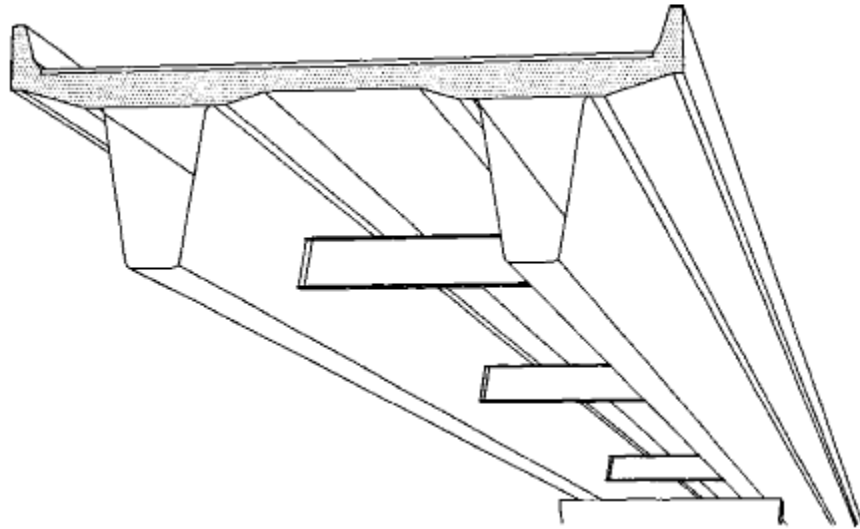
T-Box-Girder System, Typical Girder Section with 5 inch Precast, Prestressed Concrete Slab (Taly & Gangarao, 1979)
